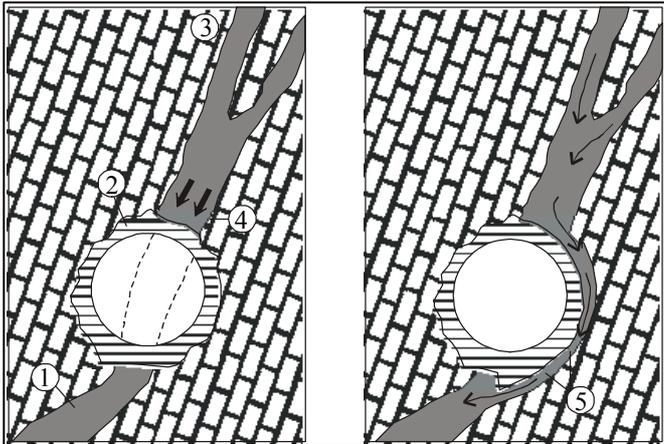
Crossing a big karst conduit by tunnelling (Milanović, 2000). 1. Karst, 2. Tunnel, 3. Water level in the channel, 4. Lining under concentrated pressure, 5. Drainage around the tunnel pipe.
